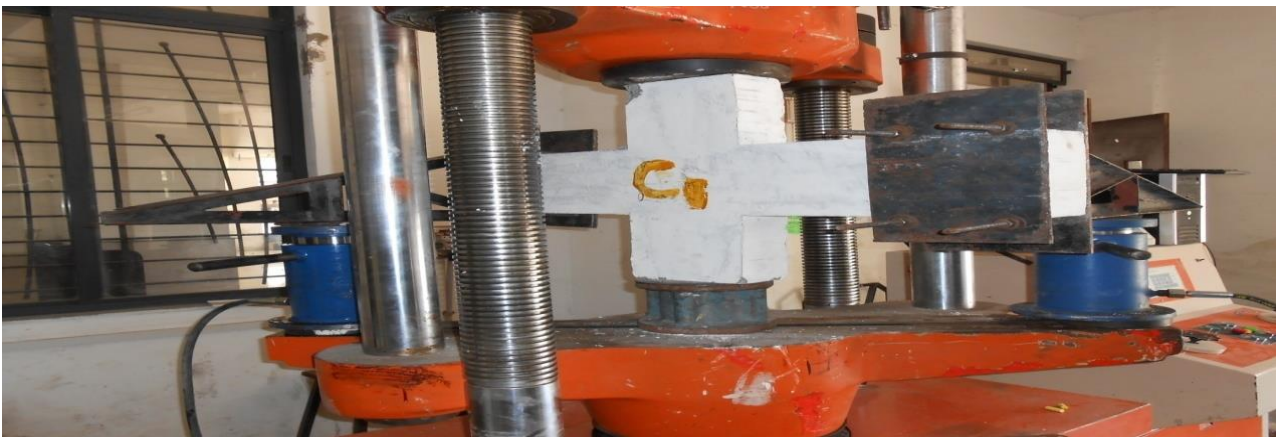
Fixing Aramid Sheet on Beam-Column Joint Beam-Column Joint
